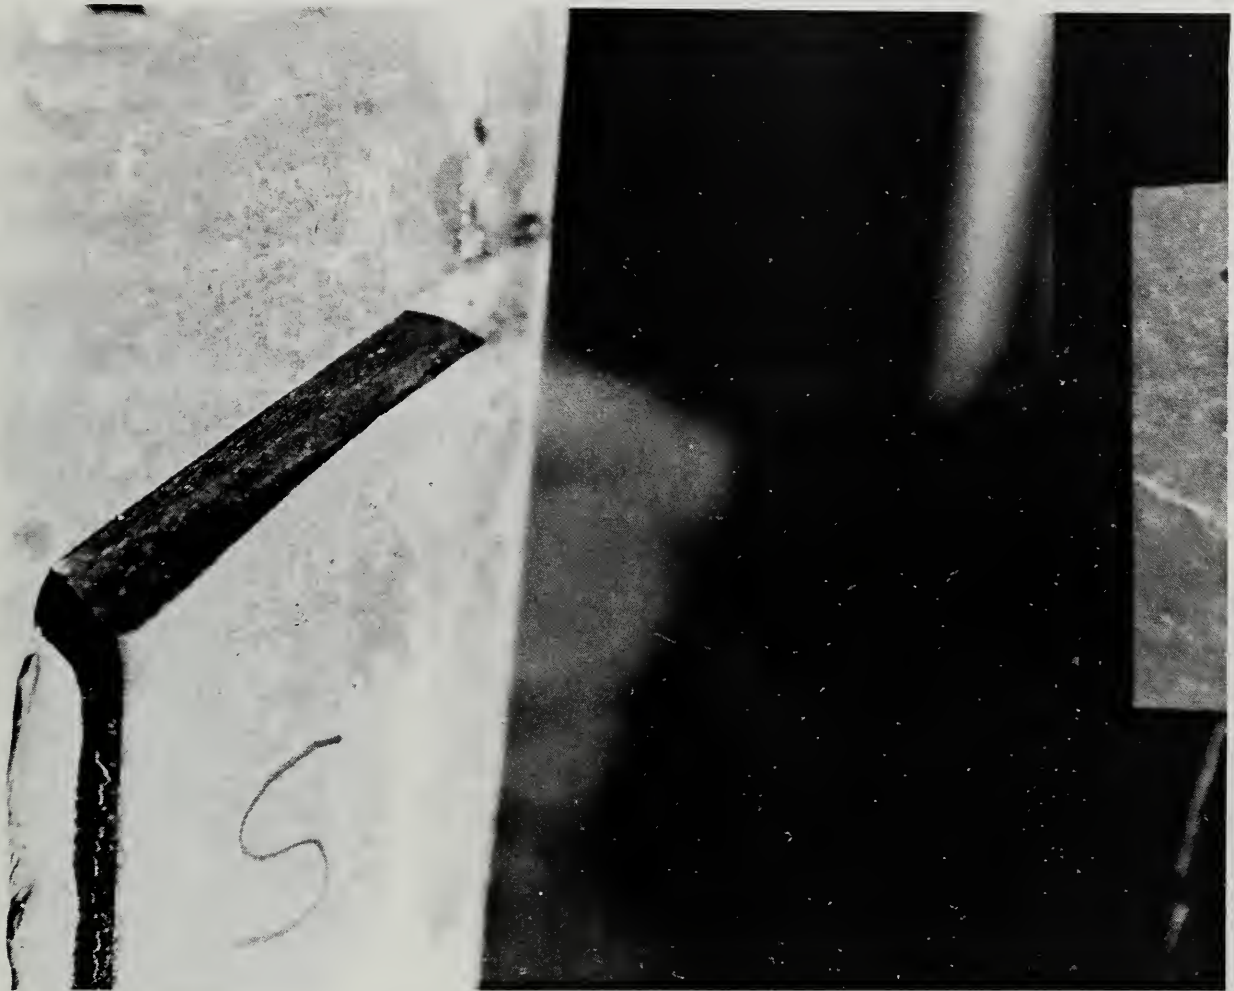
Weld block deformation in test of shearhead
